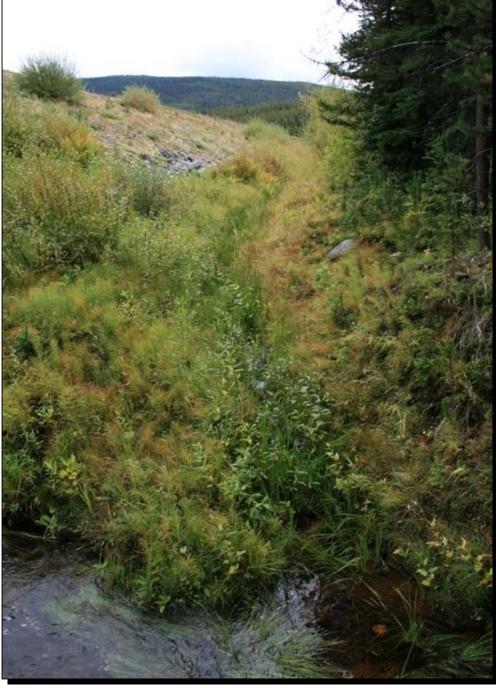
Big Meadow Lake Dam — Toe drain left-hand side of downstream face
